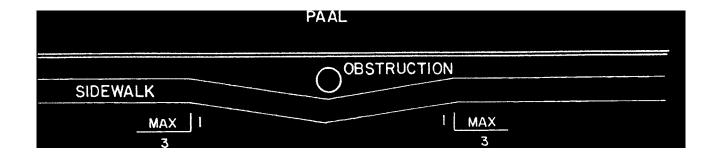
Sidewalk Location, One Side of PAAL Figure 2 - Sidewalk Location, Adjacent to Parking
